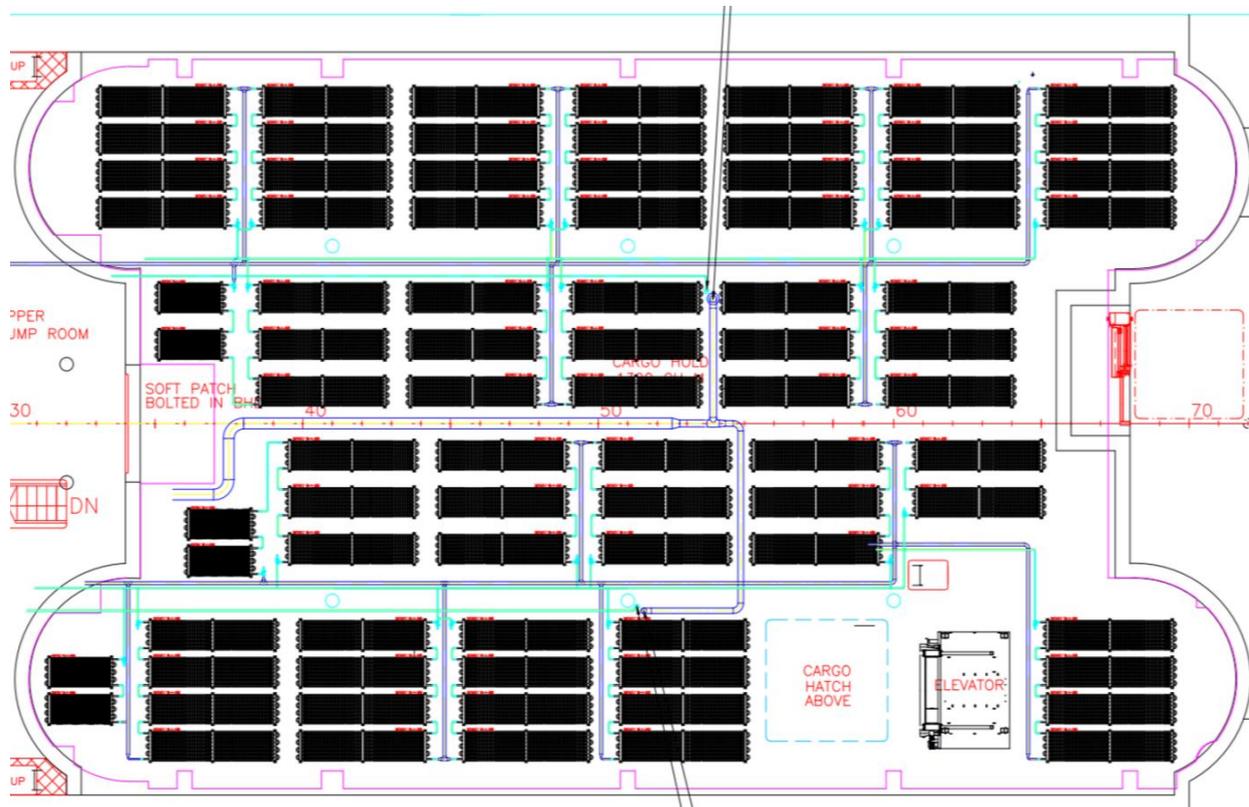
PRELIMINARY EVAPORATOR LAYOUT IN CARGO HOLD
